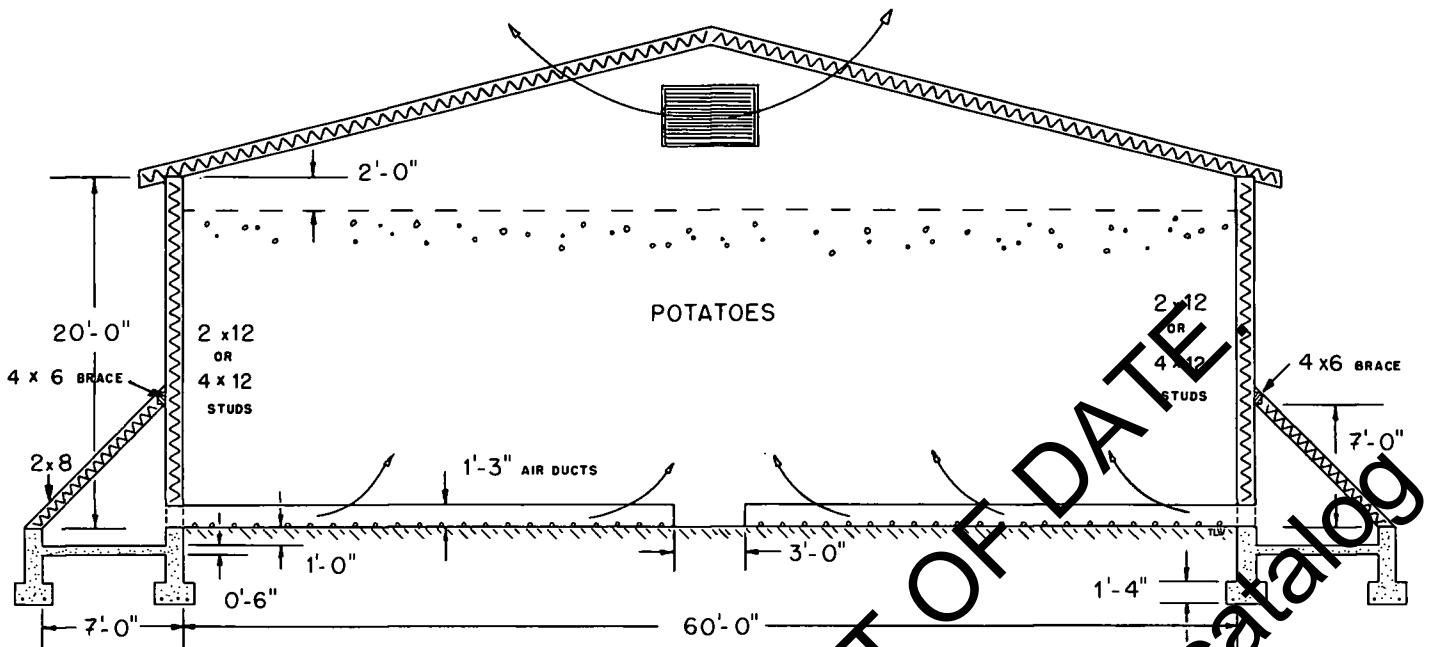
Elevation view of a bulk potato storage with braced inside walls
